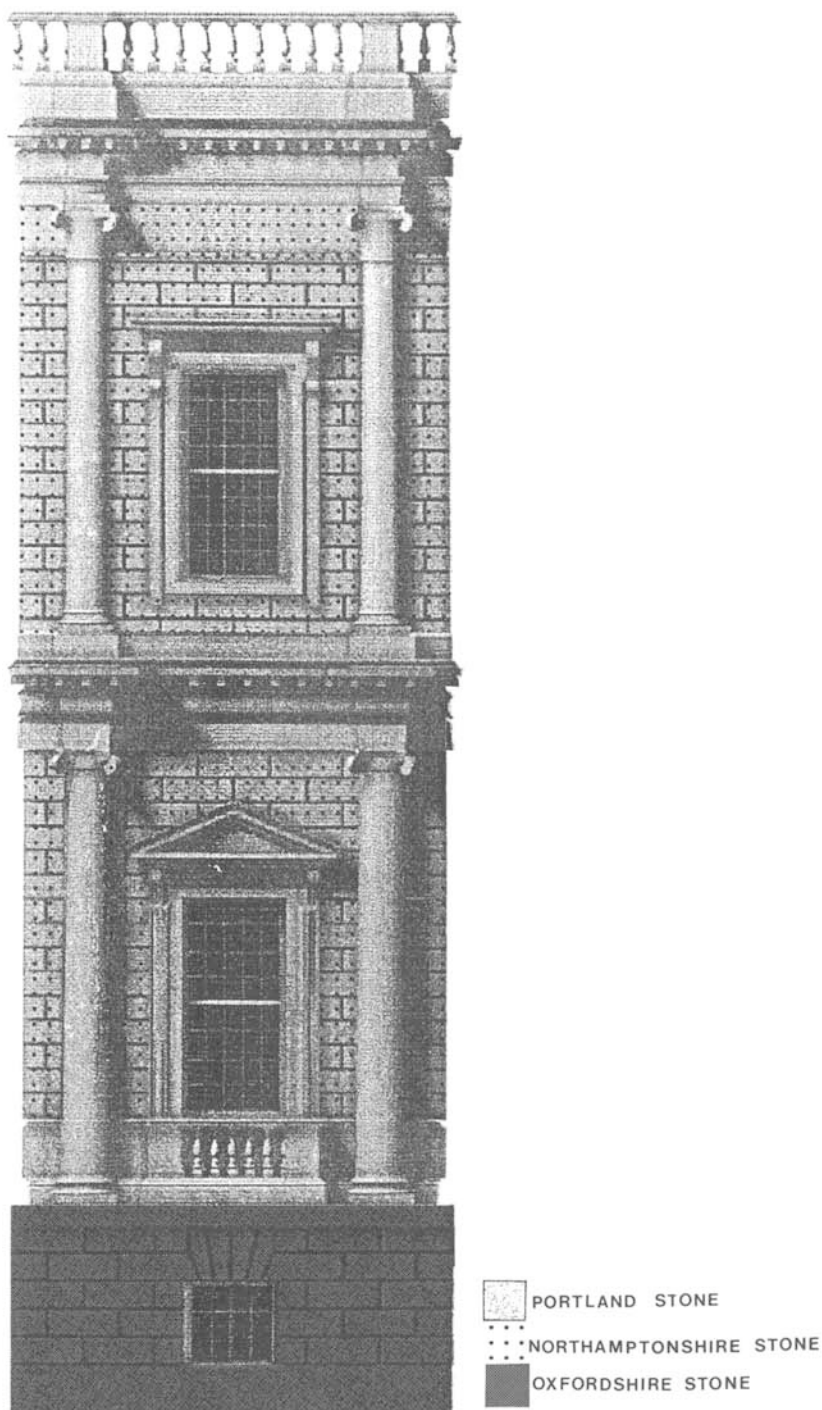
Bay of the Banqueting House, Whitehall, showing original stone colours.
